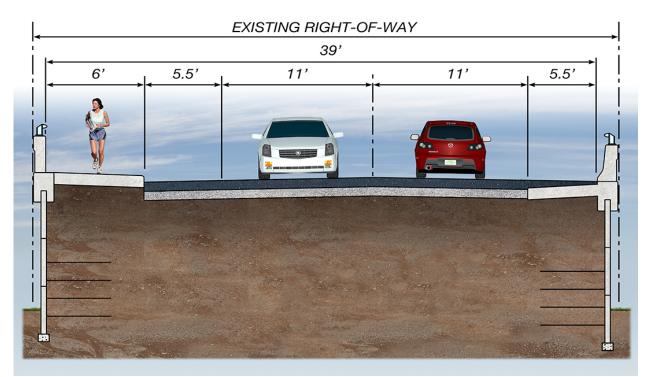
Proposed Roadway Section East of Proposed Fixed Bridge
